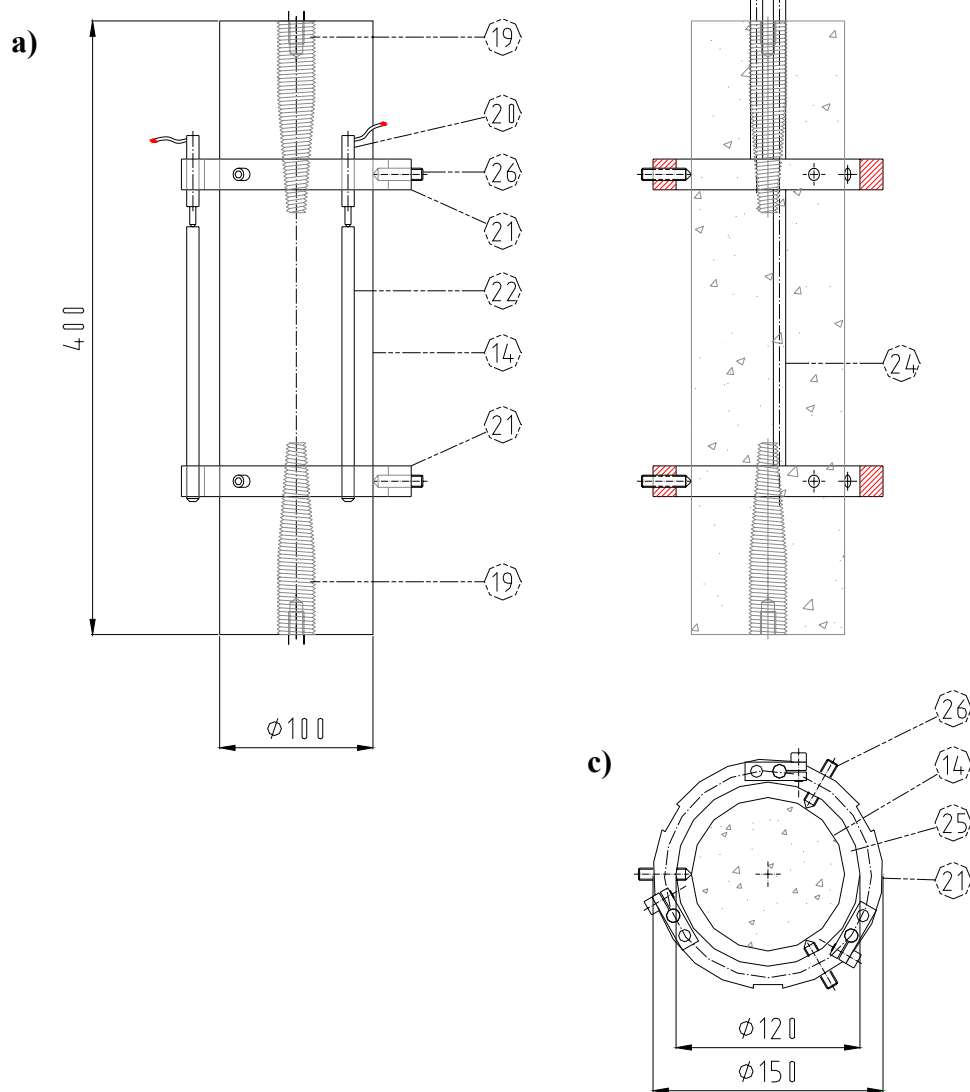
Detailed sketch of the measurement components: (Dimensions are in *mm*)
